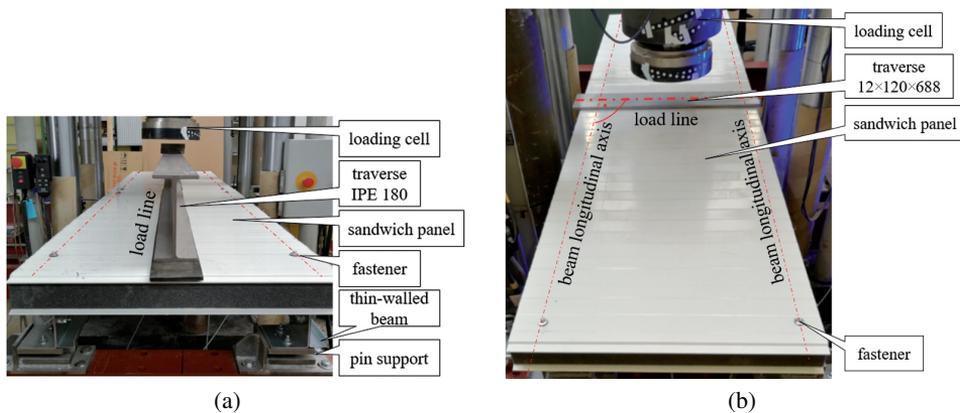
Test bed view: a)  $U$  load arrangement, b)  $P$  load arrangement
